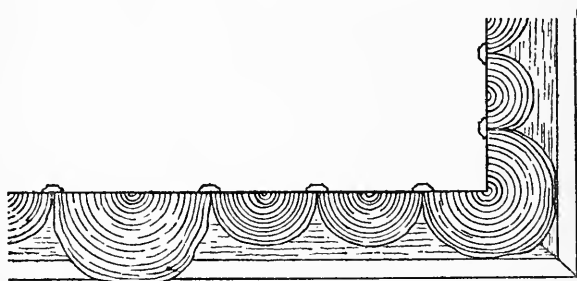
Plan of north-west corner at Greenstead. Scale, $\frac{1}{20}$ of nature.
